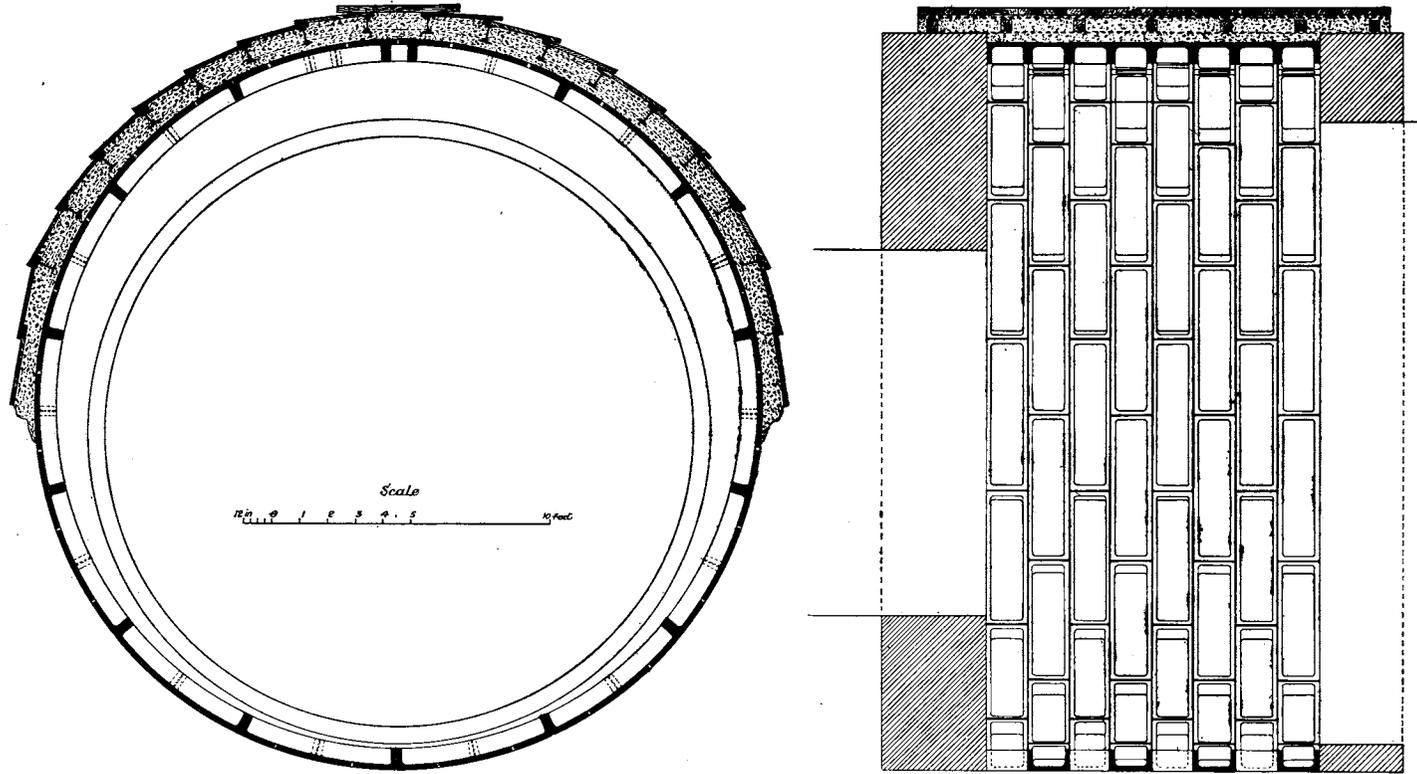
BAKER STREET AND WATERLOO RAILWAY, LONDON. FINAL STAGE
